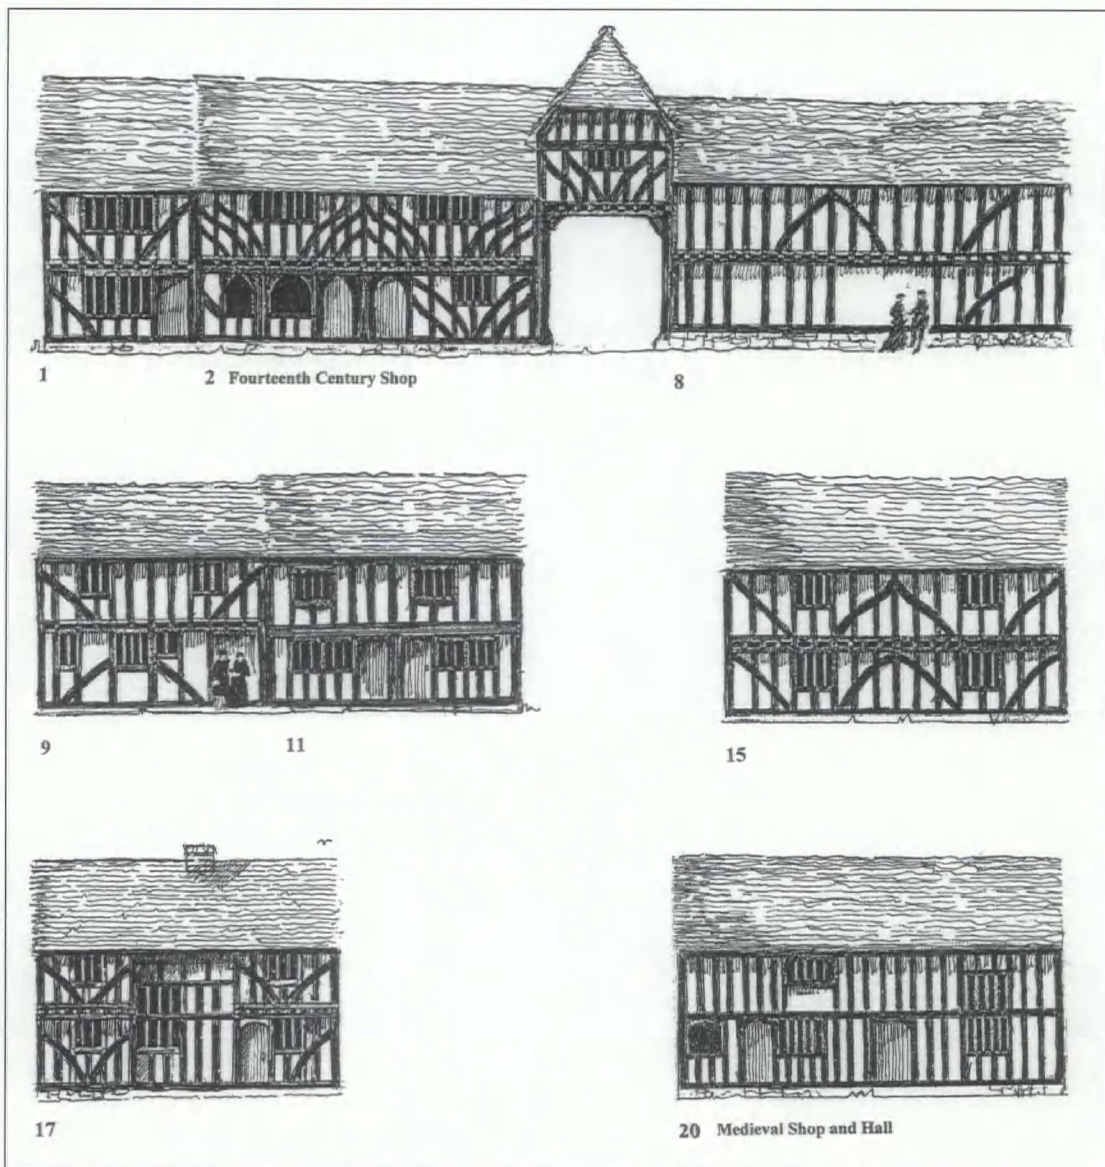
Reconstructed Elevations of Buildings to the East Side of Elstow High Street
